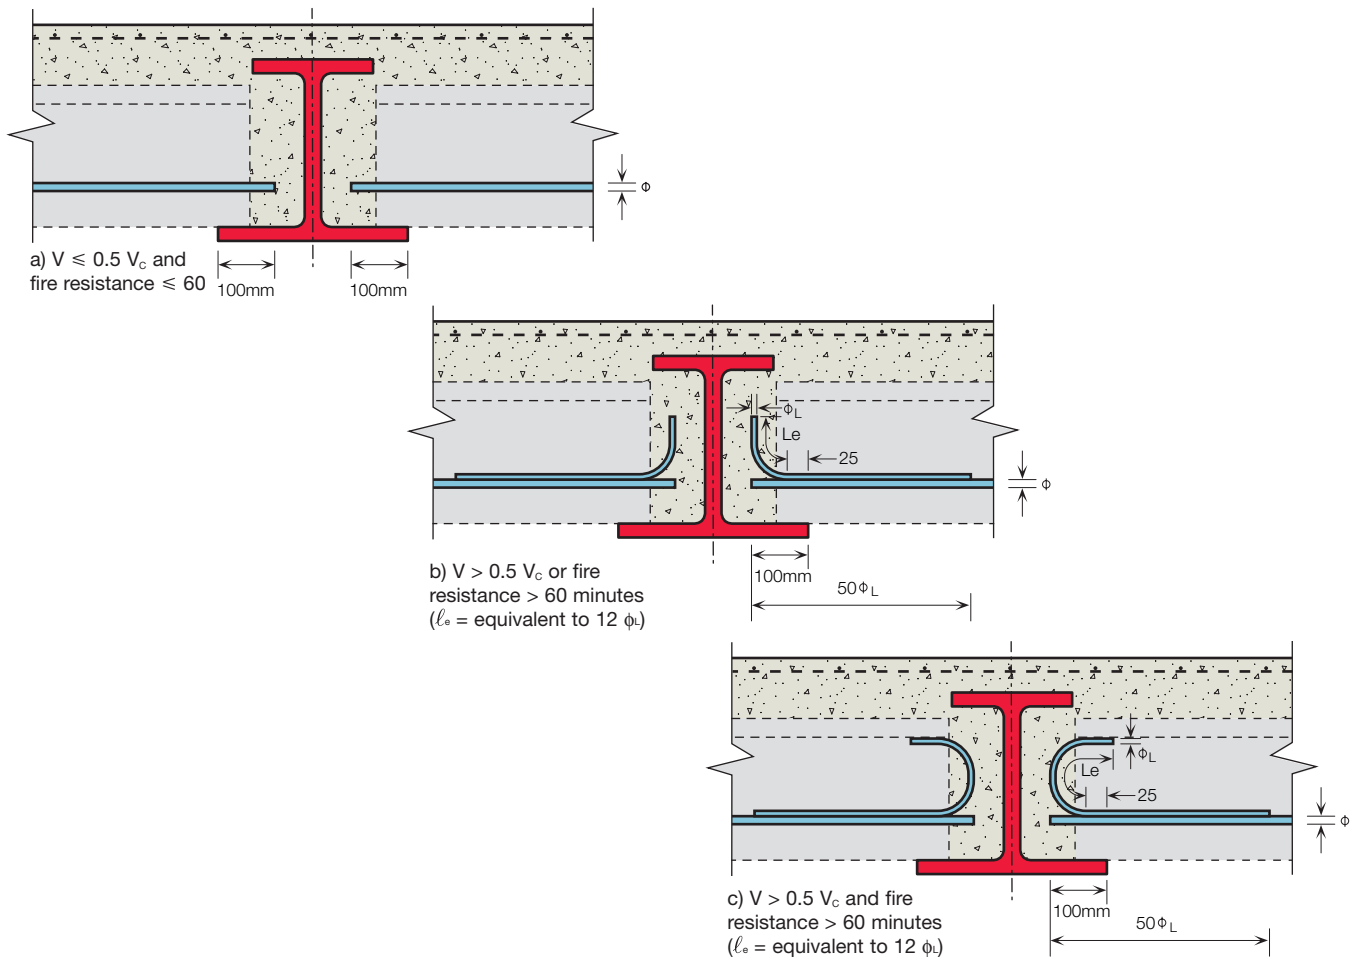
Detailing of bar reinforcement in slabs for end anchorage
